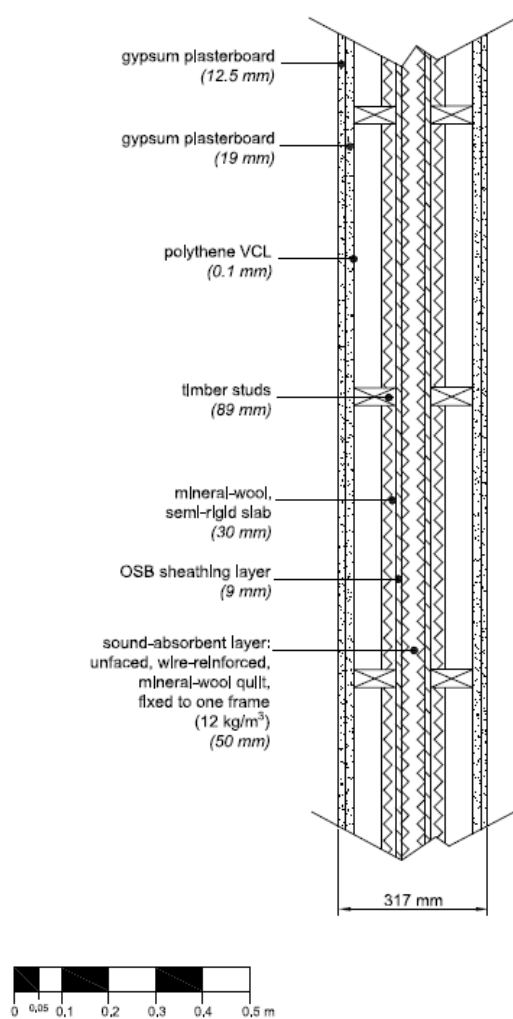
Party wall A (traditional, open-panel timber frame), horizontal section.
